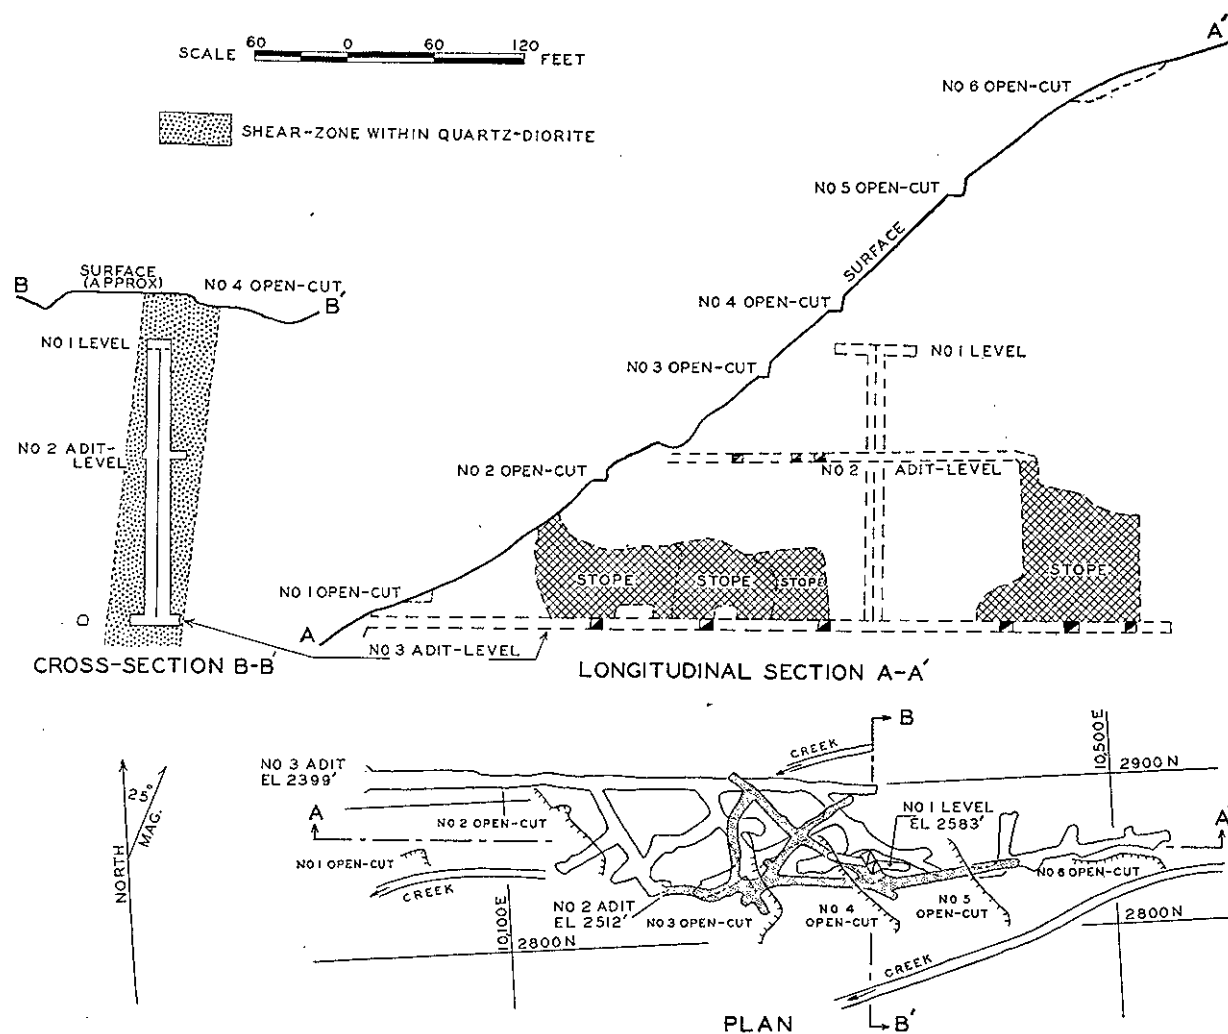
Big Star: Plan, cross-section, and longitudinal section of workings.
